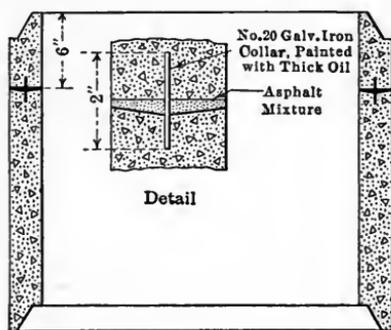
Contraction joint for hand-tamped cement pipe.
